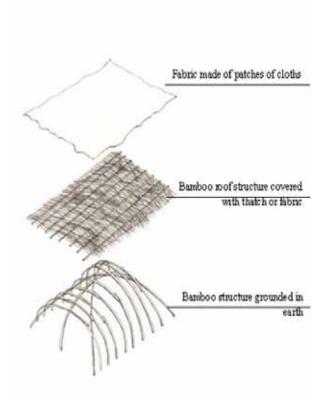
Axonometric view of the Jhugi design (Type A) Source: Building Together, 2016
